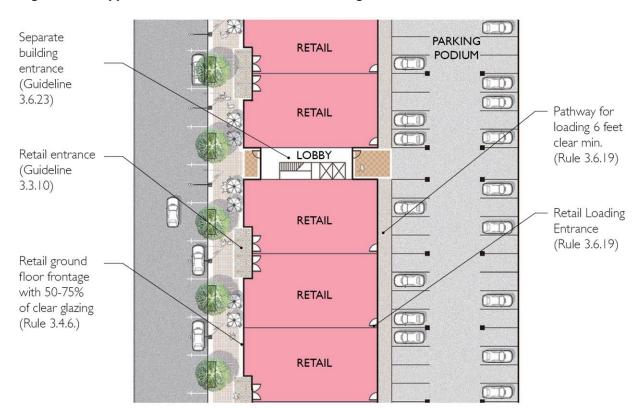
Typical Ground Floor Retail with Parking Podium
